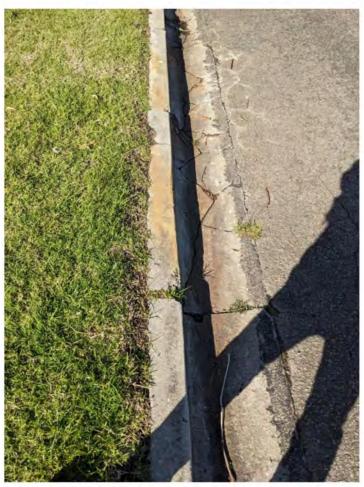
20/6/25 Looking north form 6 Prospect Hill Road, showing cracking, and staining of kerb suggesting runoff has previously flowed over of kerb.
